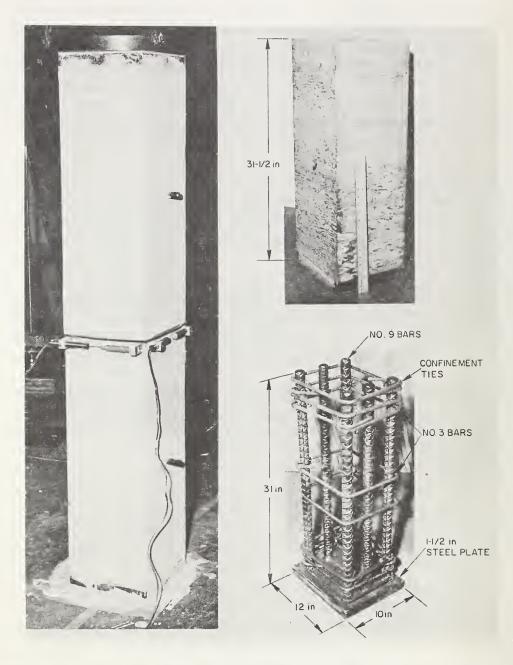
Specimen Used in Phase I Column Connection Tests
